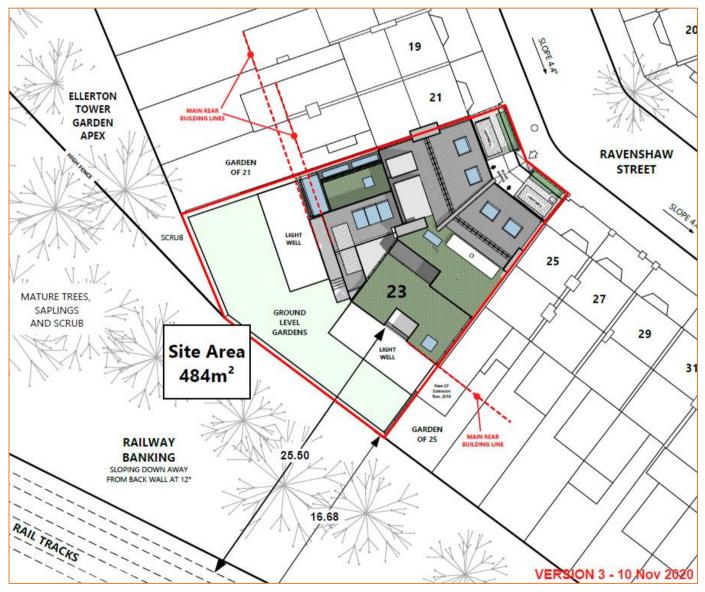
Proposed Site Plan (Source: Chris Taylor)
